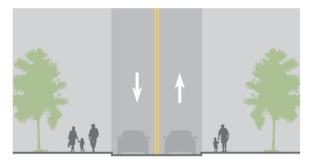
| Alternative 4 cross-section of Tysons One Place from Tysons Corner Metrorail Station to International Drive.
